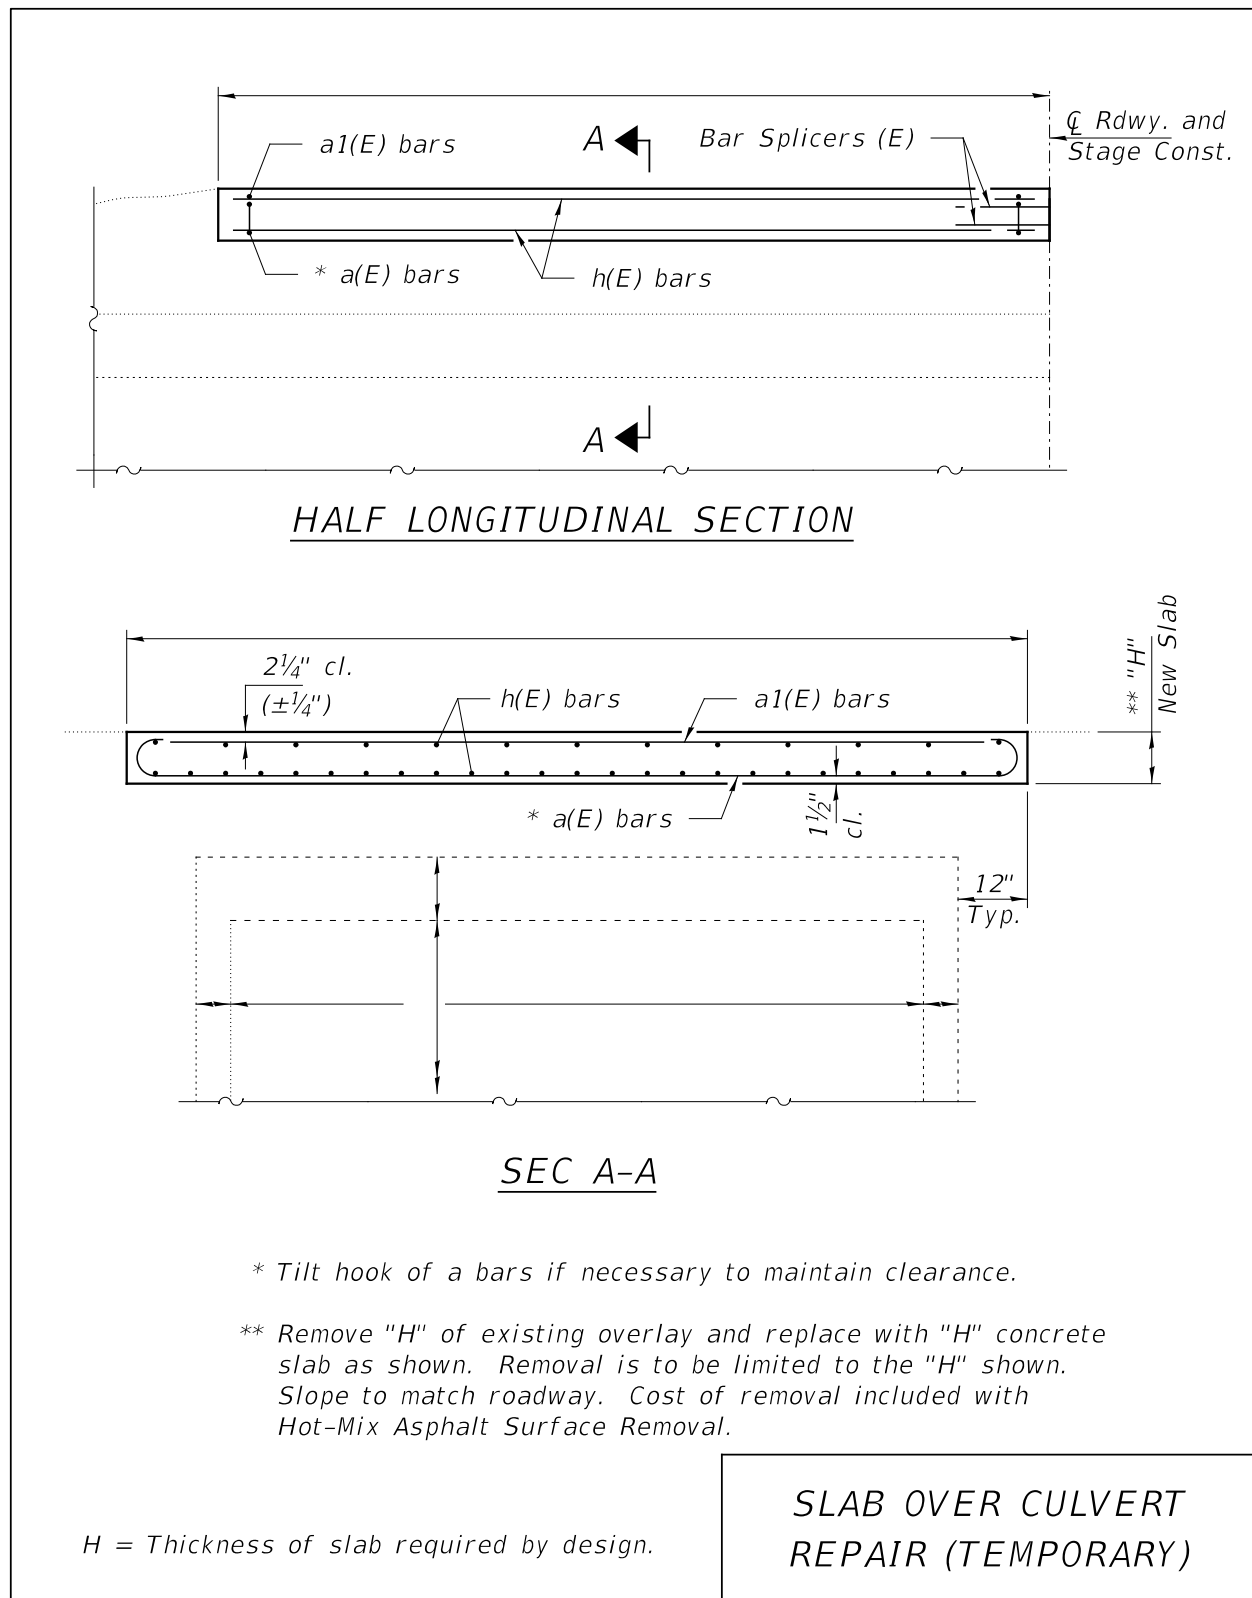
Slab Over Culvert Repair (Temporary)
